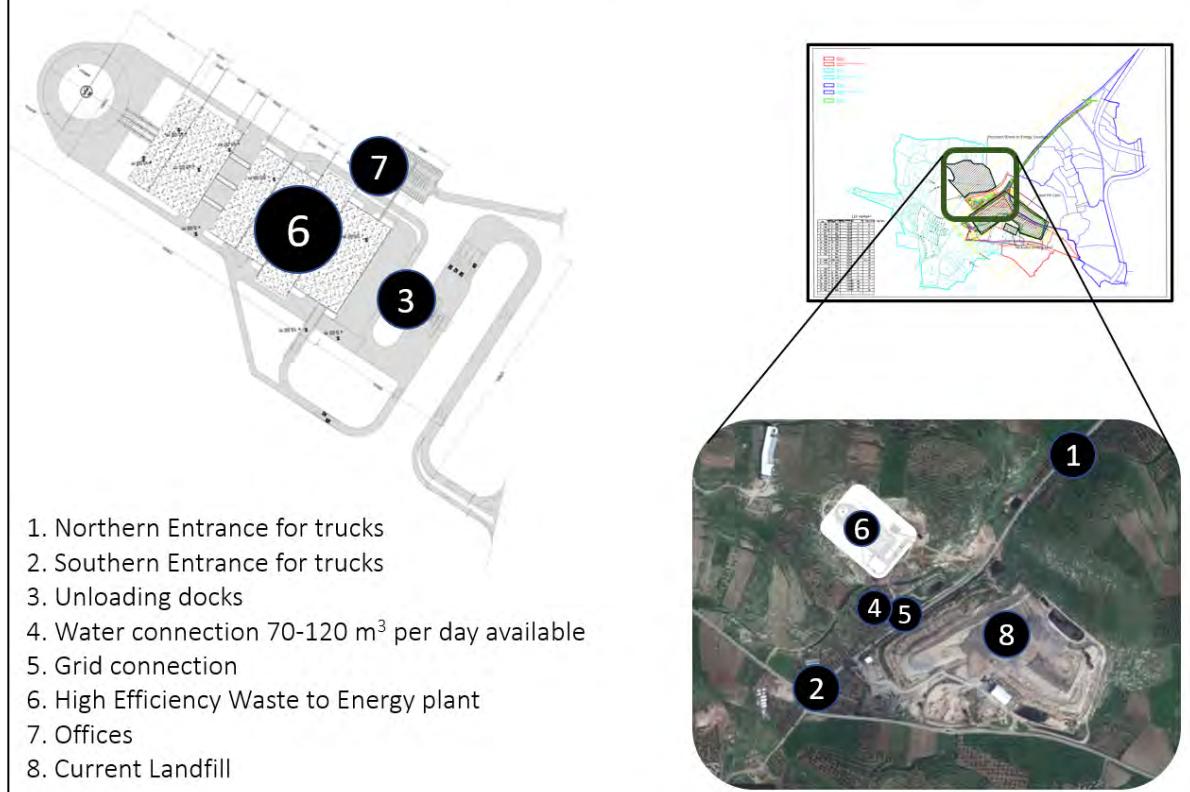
Preliminary Impression and layout for WTE plant at Zahrat Al Finjan
